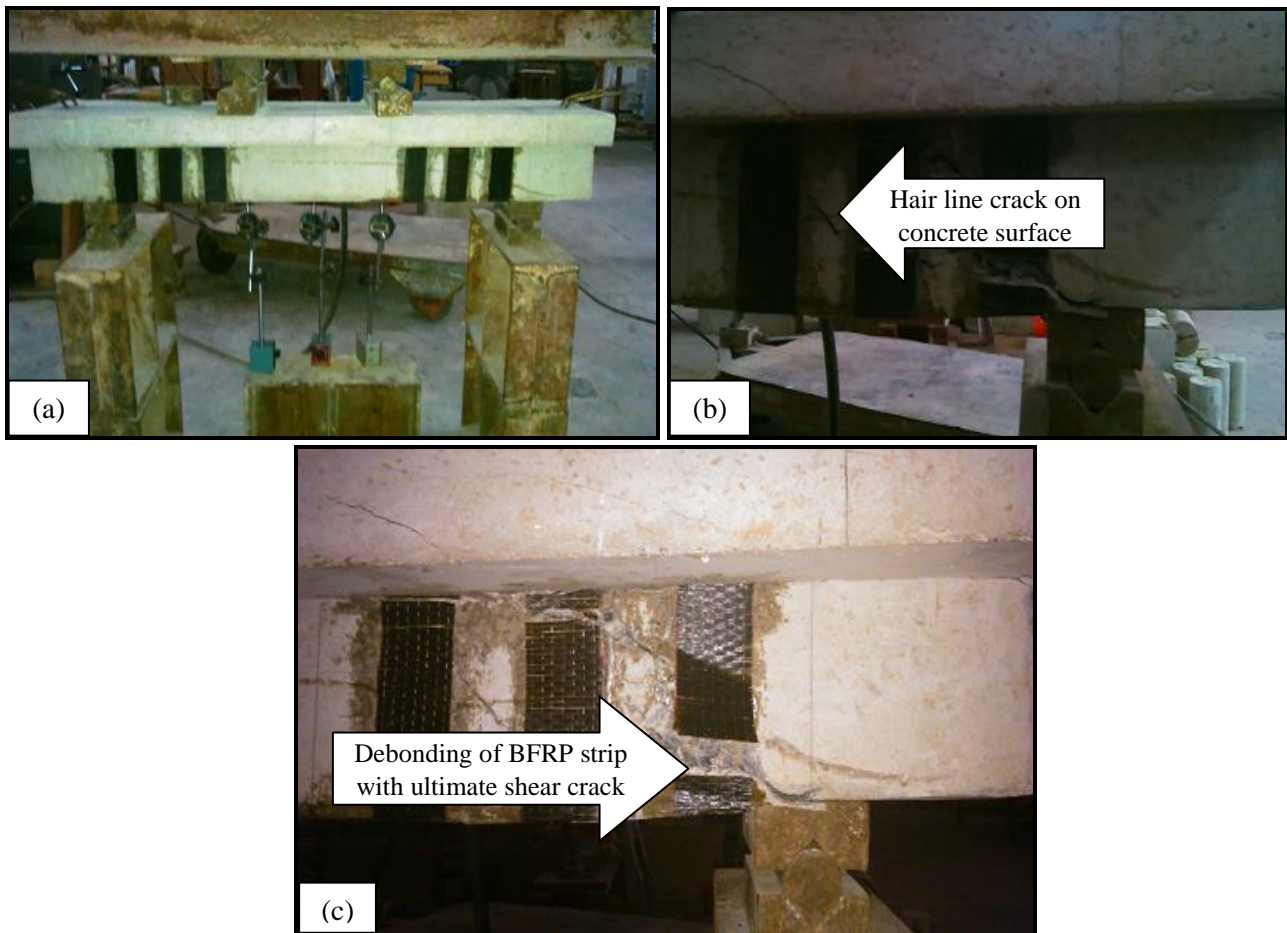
(a) Experimental Setup of beam SB3 under four-point loading system, (b) Hair line crack started in shear region at a load of 75kN, (c) Ultimate failure of beam SB3 by debonding of BFRP strip followed by diagonal shear crack
